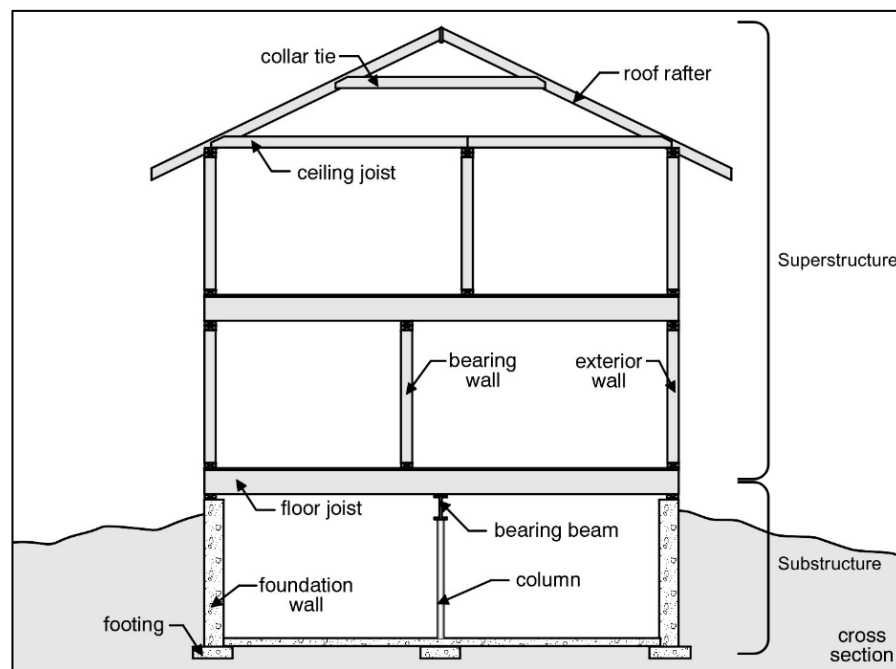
Cross-Sectional Diagram of a Typical House Structure
